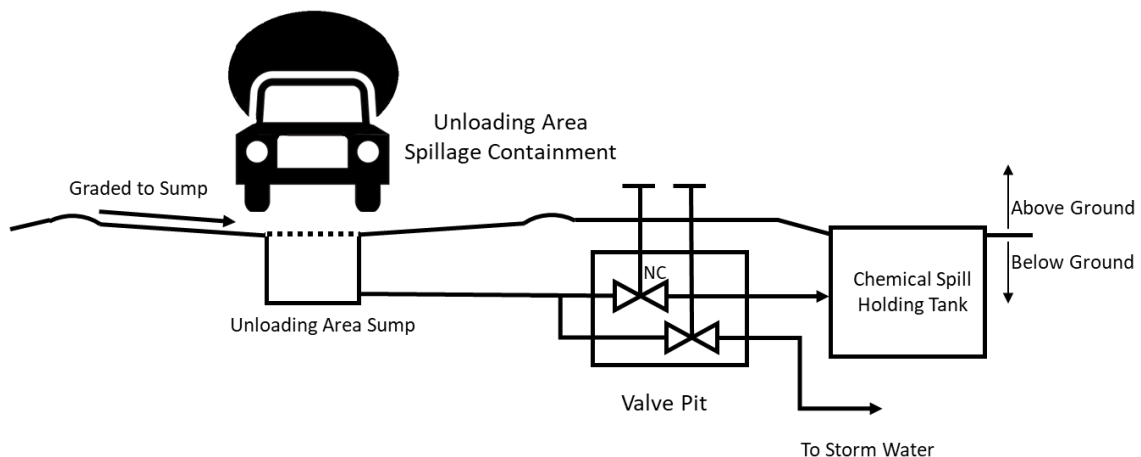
Section view showing unloading bay, sump, and drainage arrangement
